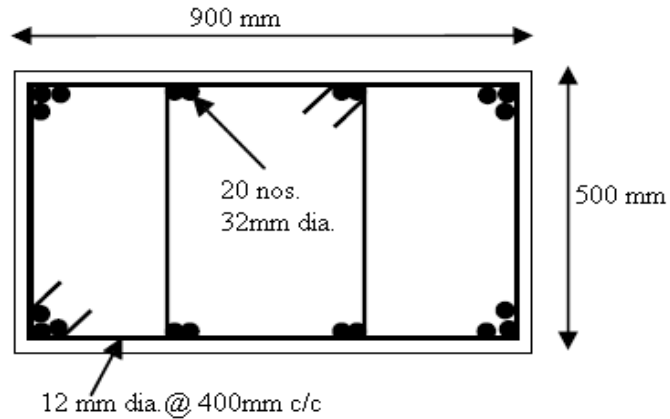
Cross section of the NSC column- ordinary detailing 400 mm stirrups spacing.
